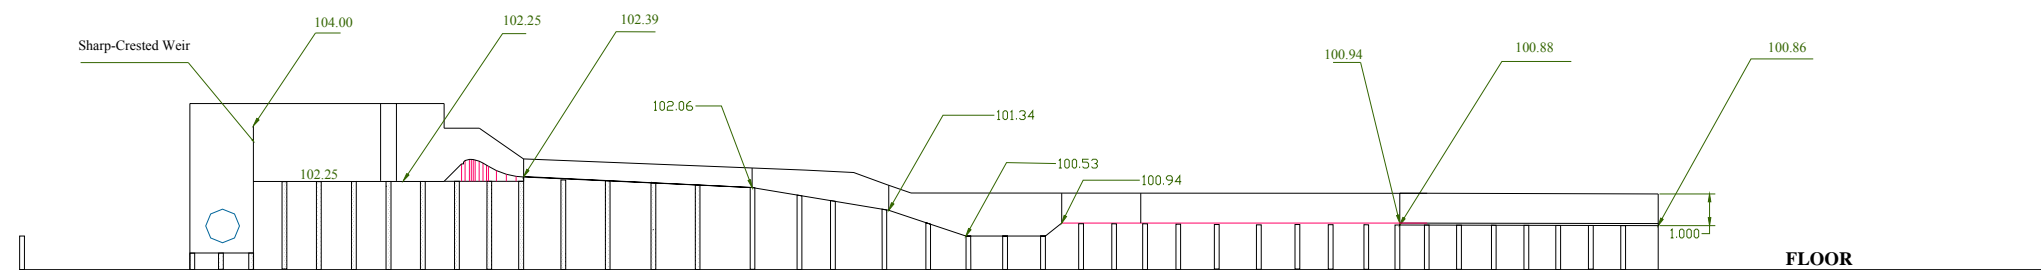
The final proposed modification to the outlet structure with a stilling basin at an elevation of 1.5 ft above the datum.
